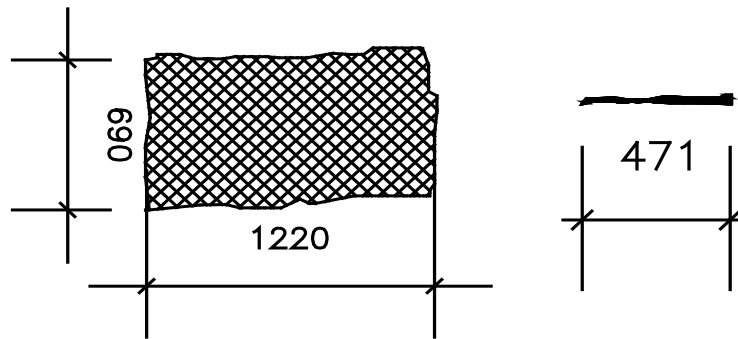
41: Figure showing the material used to build their dwelling envelope
